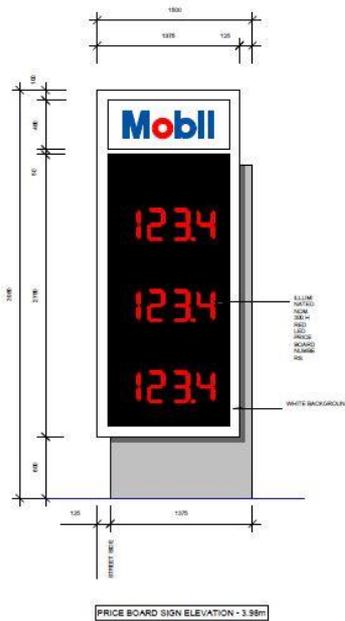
4 Metre Pylon Sign (Facing Henry Place)
